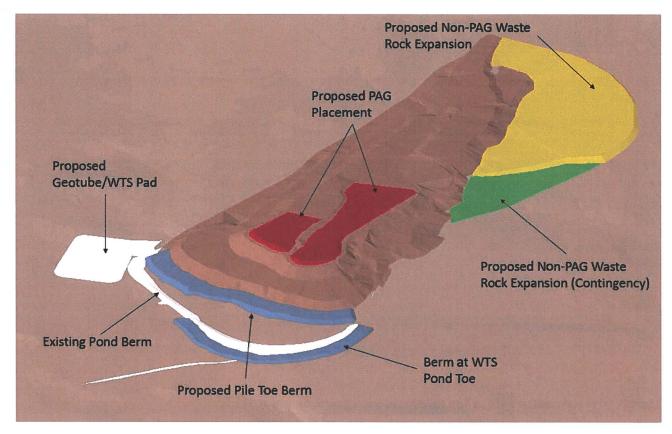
Winter 2018 Waste Rock Deposition Plan-Plan View
